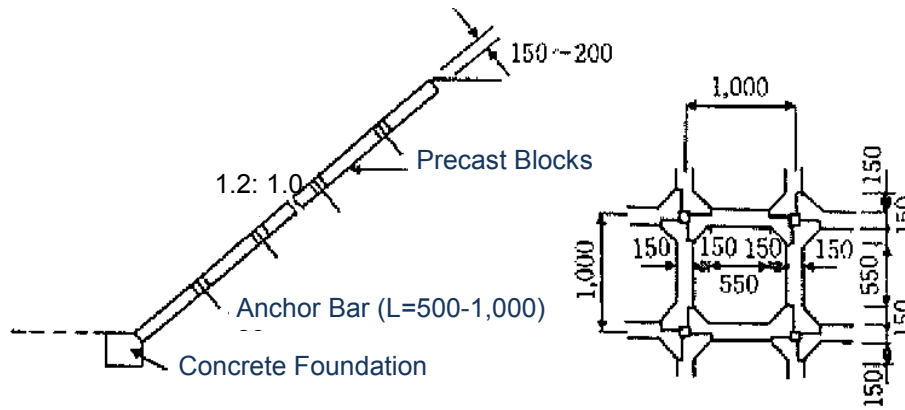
EXAMPLE OF CRATING CRIB WORKS USING PRECAST BLOCKS
